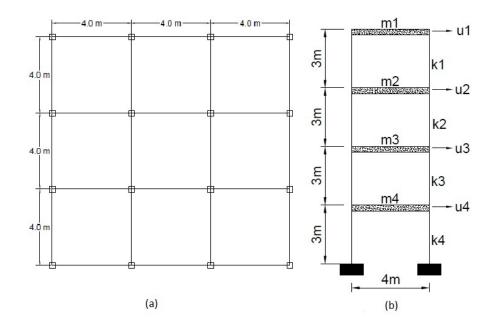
(a) Geometrical Plan, (b) Lumped Mass Model of G+3 Storey building
